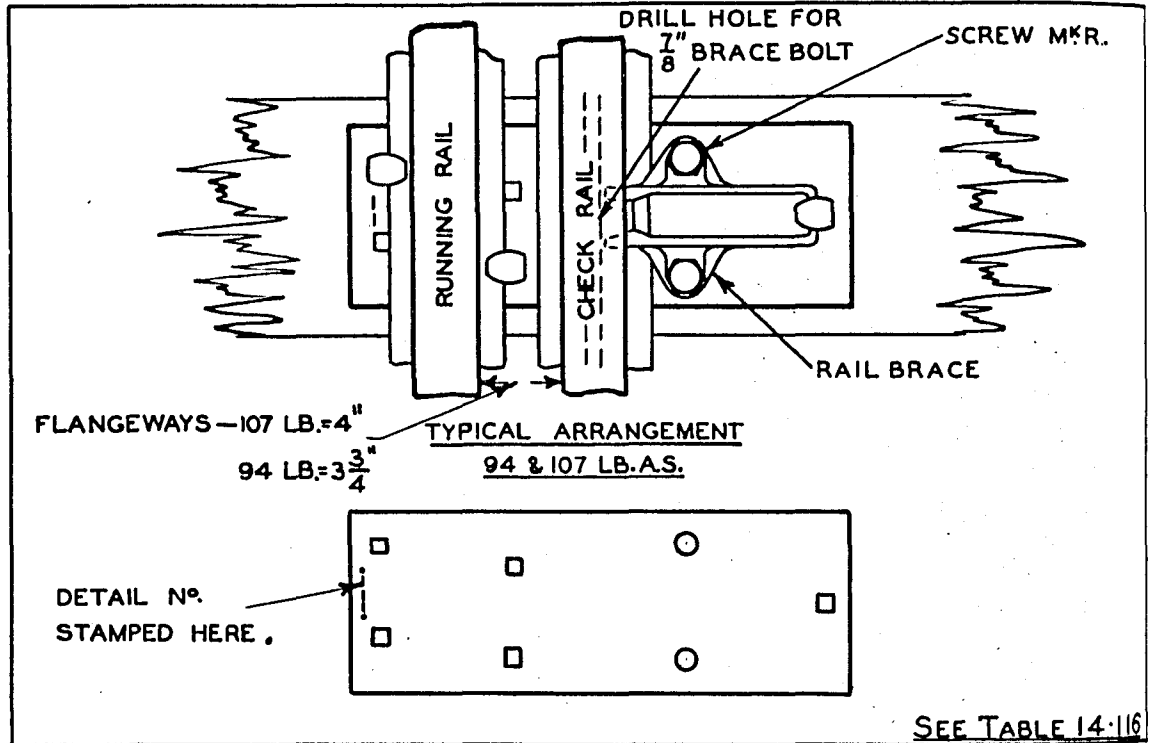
CHECK RAIL GAUGE PLATE . 062.AND 063. SERIES.
